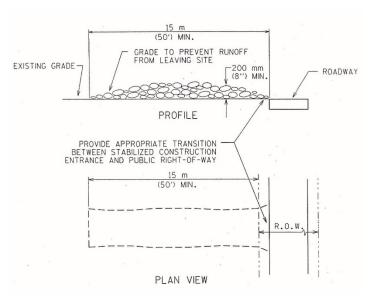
Stabilized Construction Entrance (SCE) plan view. City of Austin Detail 641S1.
